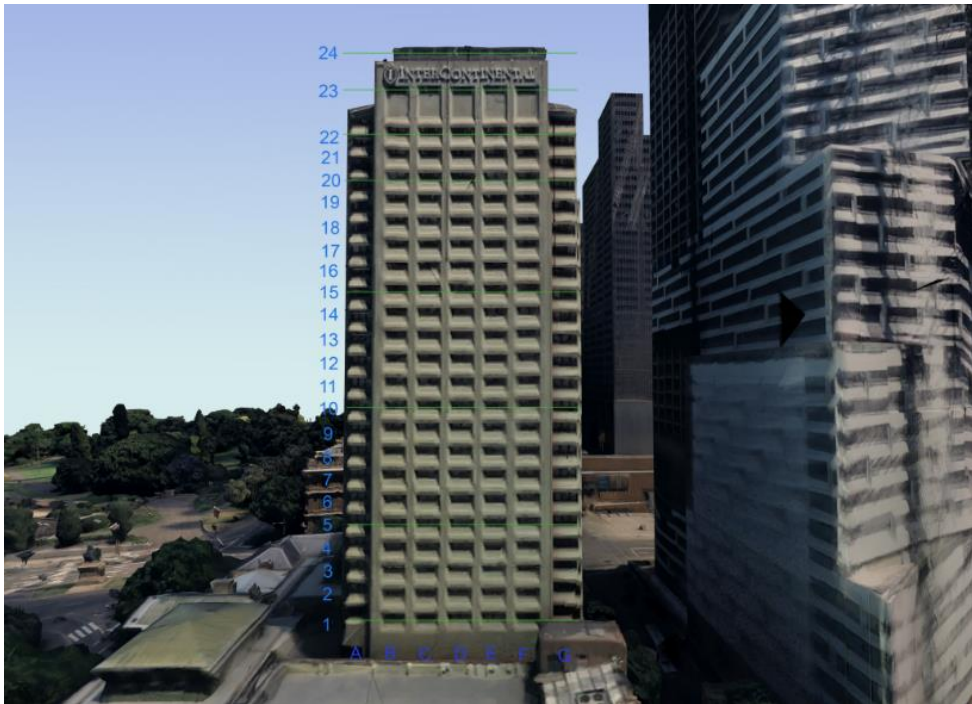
Northern elevation of the InterContinental Hotel showing storeys and windows labelled A-G (left to right)
